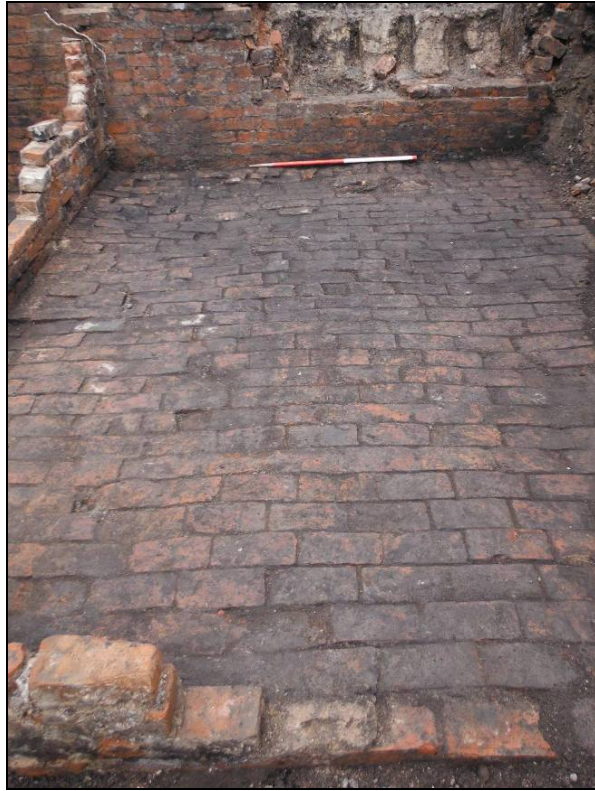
Brick surface (214) with structural wall (220) and internal partition walls (212), Trench 2. Scale = 1m. Note the demolition damage to wall (220) caused by a large, toothed bucket.
